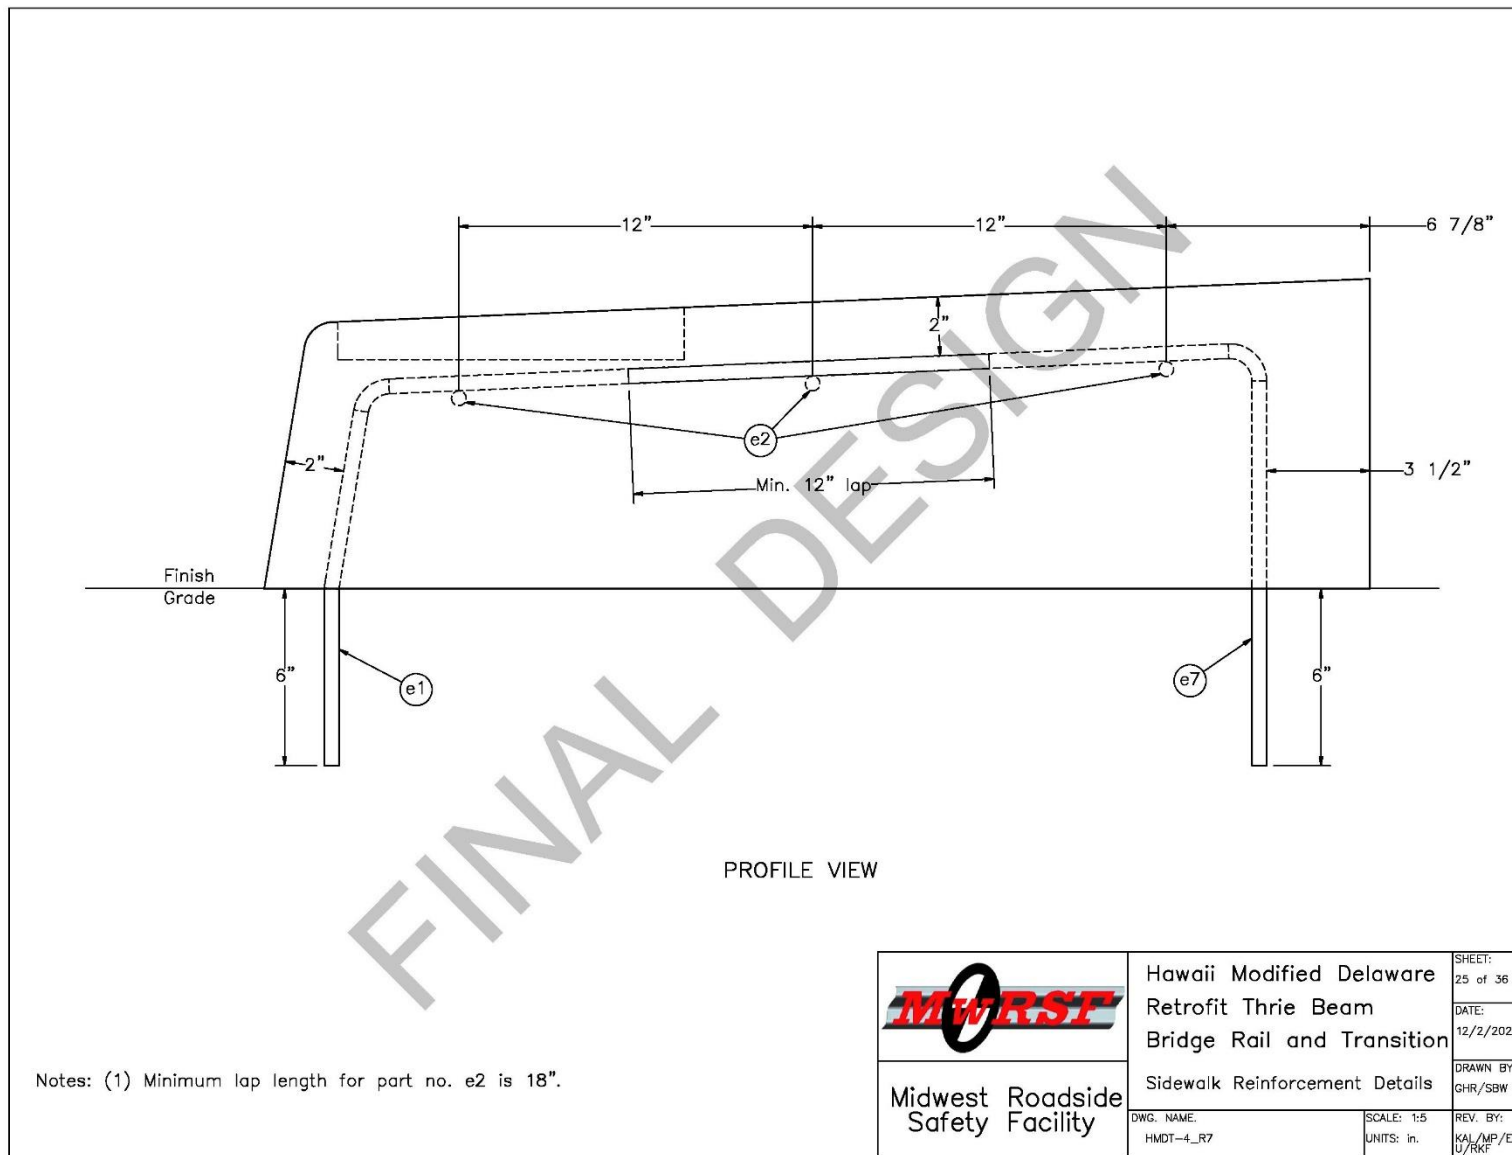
Sidewalk Reinforcement Details, Test No. HMDT-4
